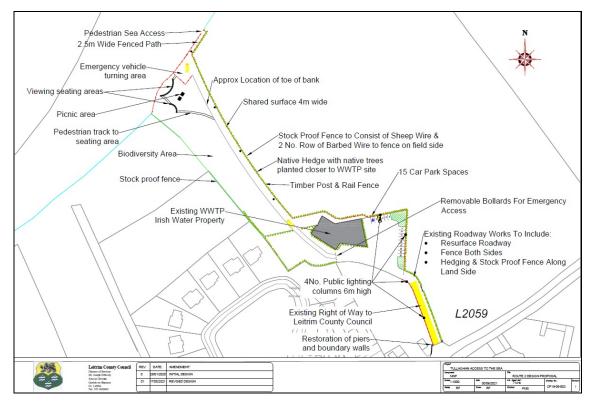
Detailed map of the proposed trail and carparking facilities at Tullaghan, Co. Leitrim.
